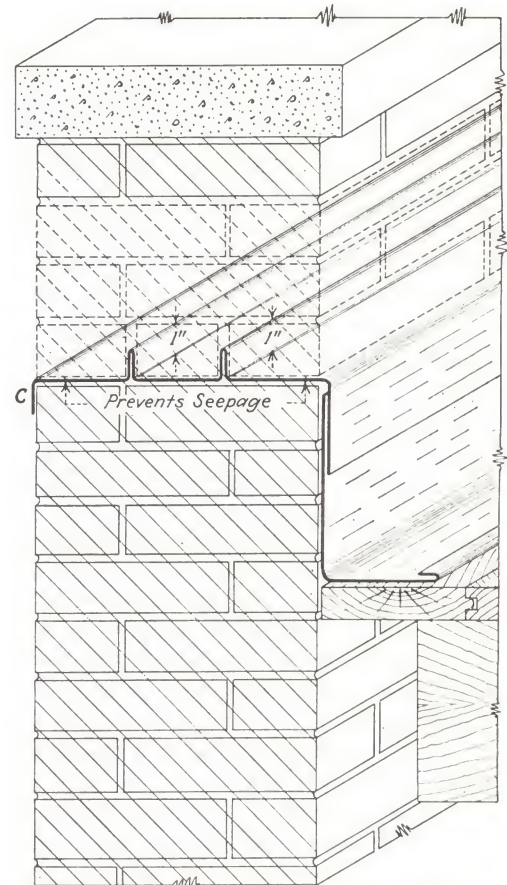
CAP FLASHING COVERING ENTIRE WALL
